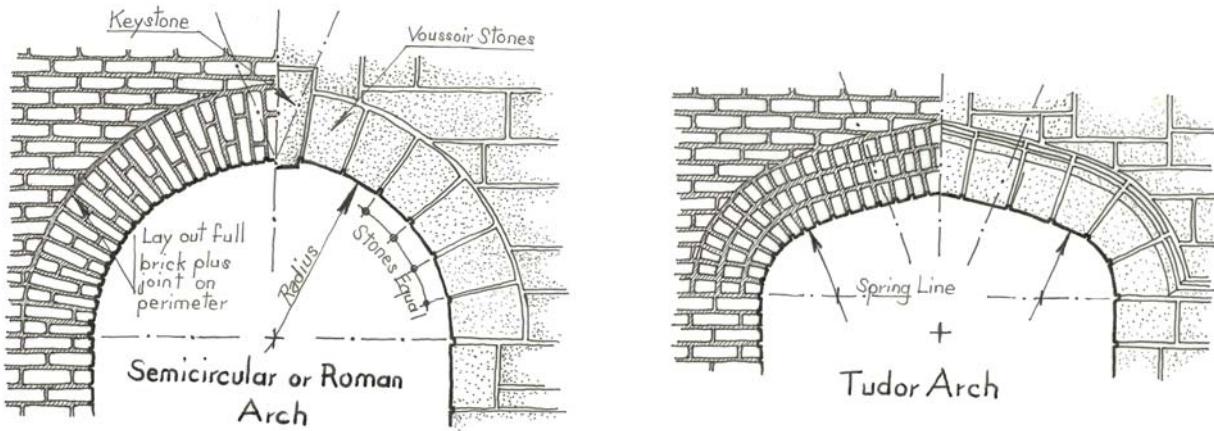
Common arch shapes. (Drawn by the author, adapted from *Masonry Design and Detailing*, p. 358)
